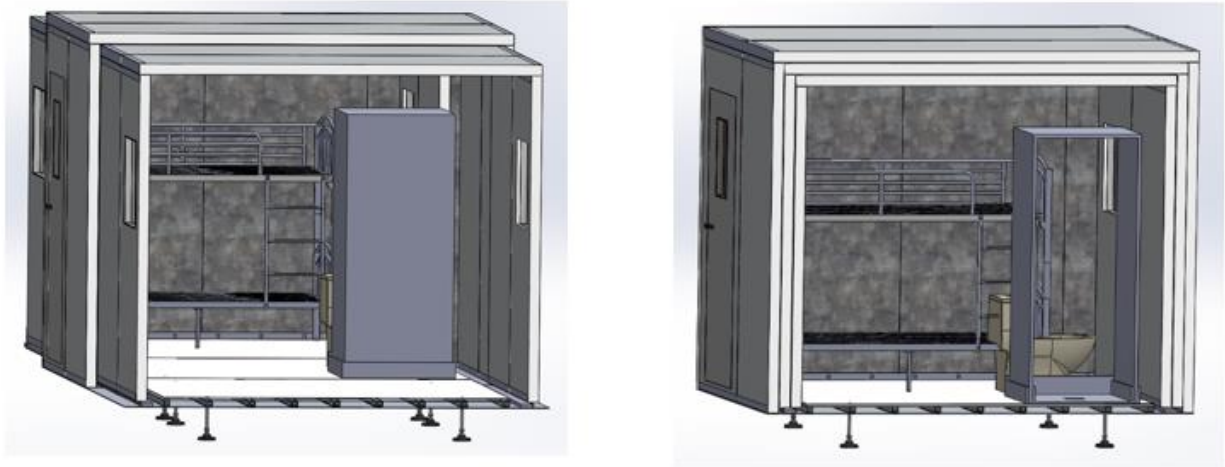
Final design cross-sectional view, expanded (left) and collapsed (right)
